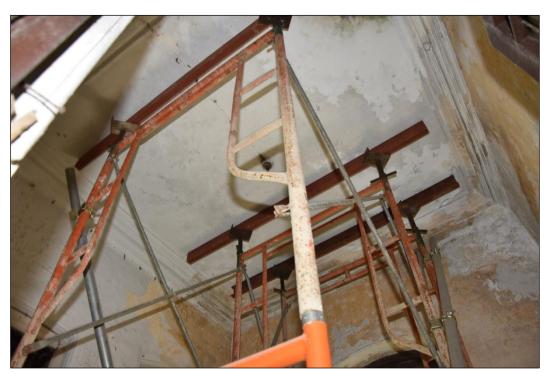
Main Building, ground floor, typical stepped ceiling cornice, (8<sup>th</sup> October, 2024)
